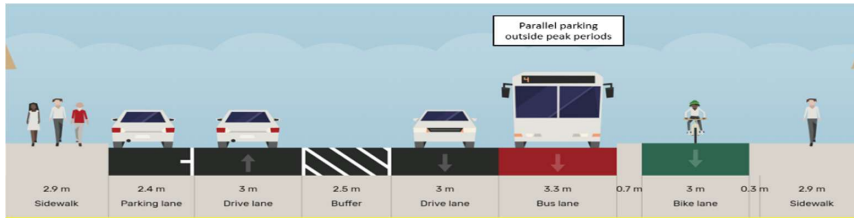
Option 1 – Hutt Road Indicative Plan and Cross Section
